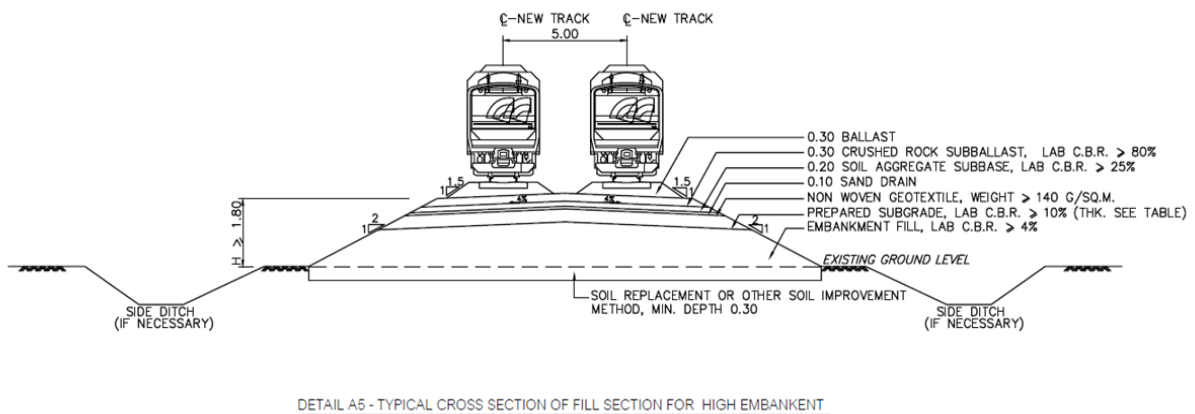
Typical section of embankment: Hat Yai – Songkhla subsection
